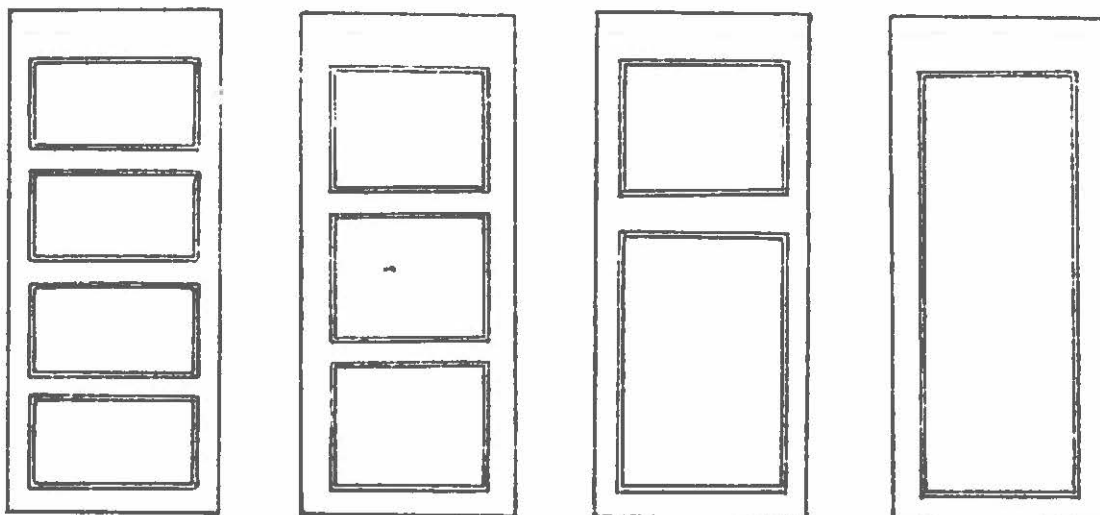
STANDARD WOOD PANELLLED DOORS, EXTERIOR DOORS GLAZED.
